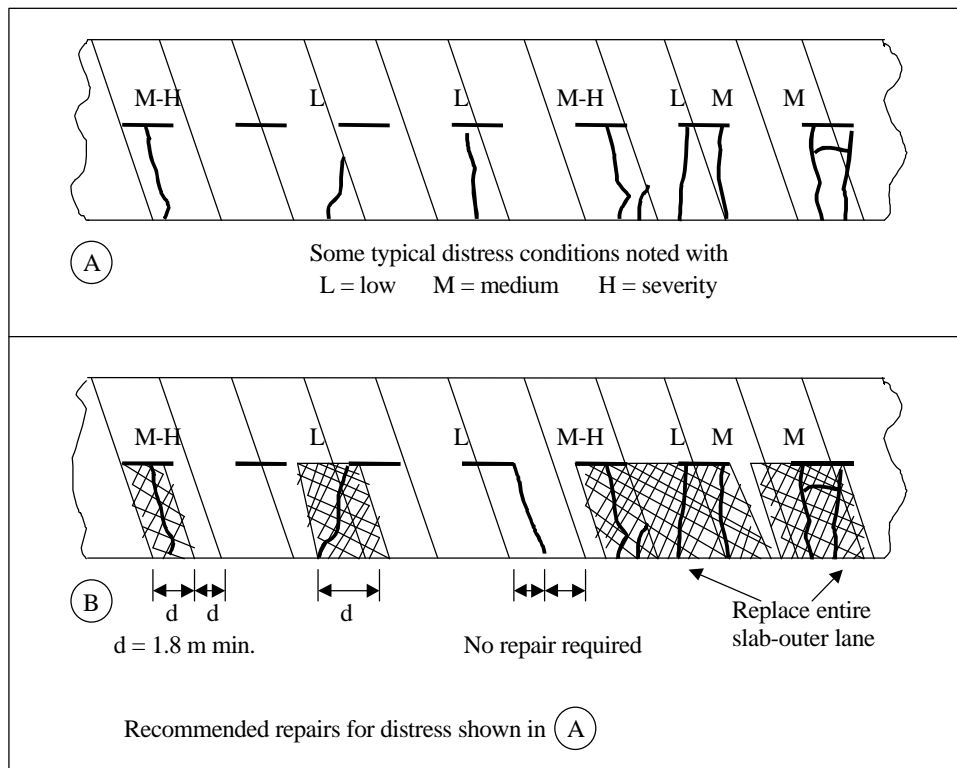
Repair recommendations for jointed plain concrete pavements (JPCP).
